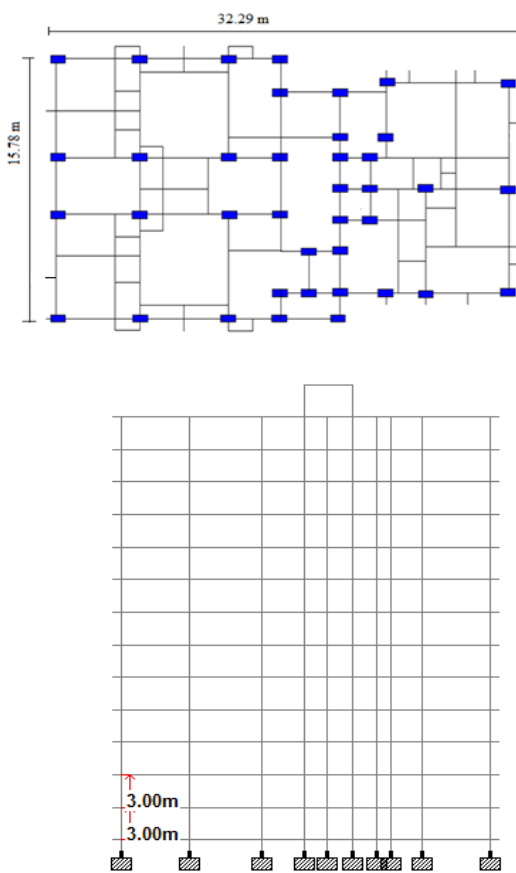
Plan and Elevation of G+12 RCC Multistoreyed Building
